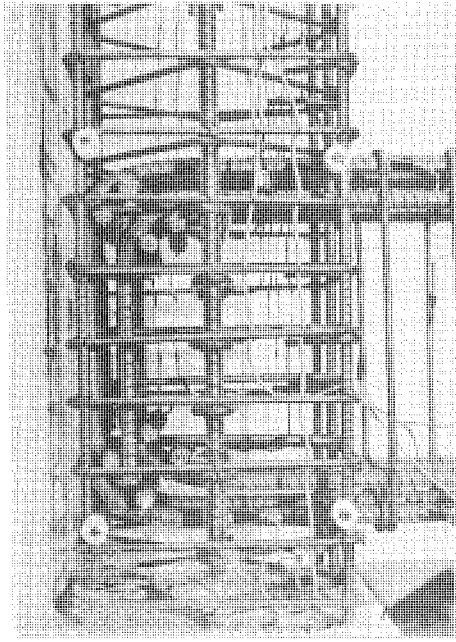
Some Reinforcement Arrangements for Ductile Reinforced Concrete Frames.
